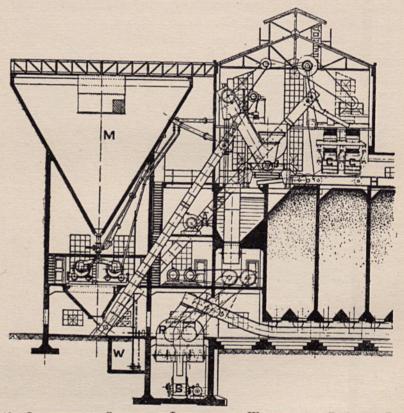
Longitudinal Section of Intermittent Washery and Drainage Plant
